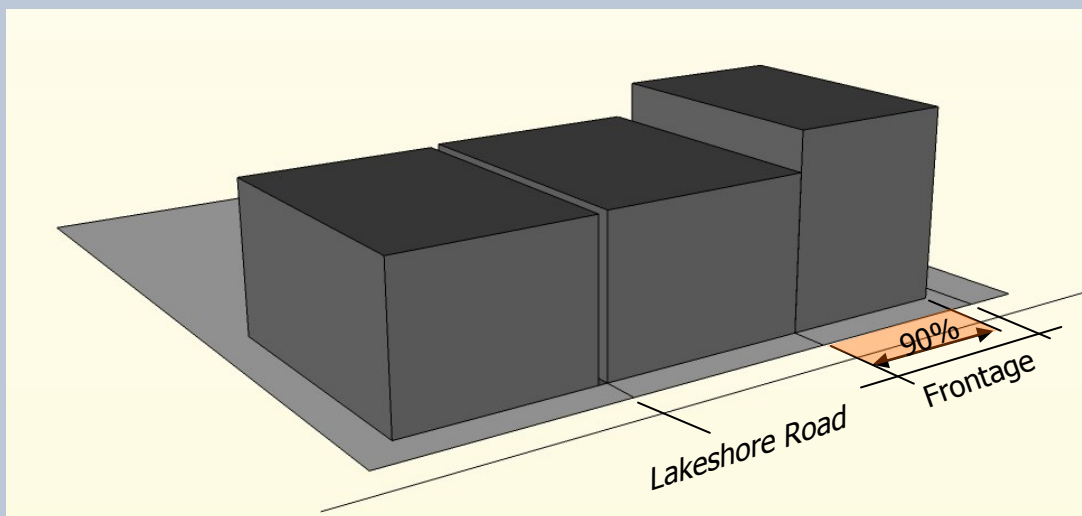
A minimum of 90% of the building shall front onto Lakeshore Road East and West and be within 0.0 m to 3.0 m
